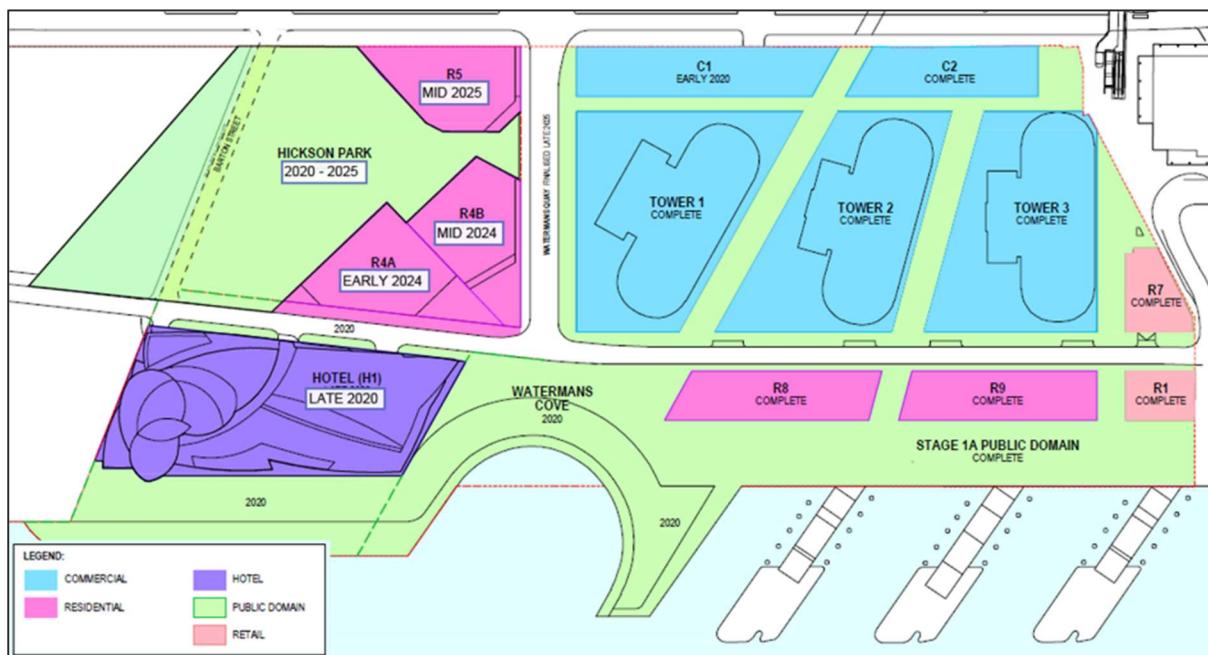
| Barangaroo South and predicted construction staging and completion dates (Source: Proponent's EA)
